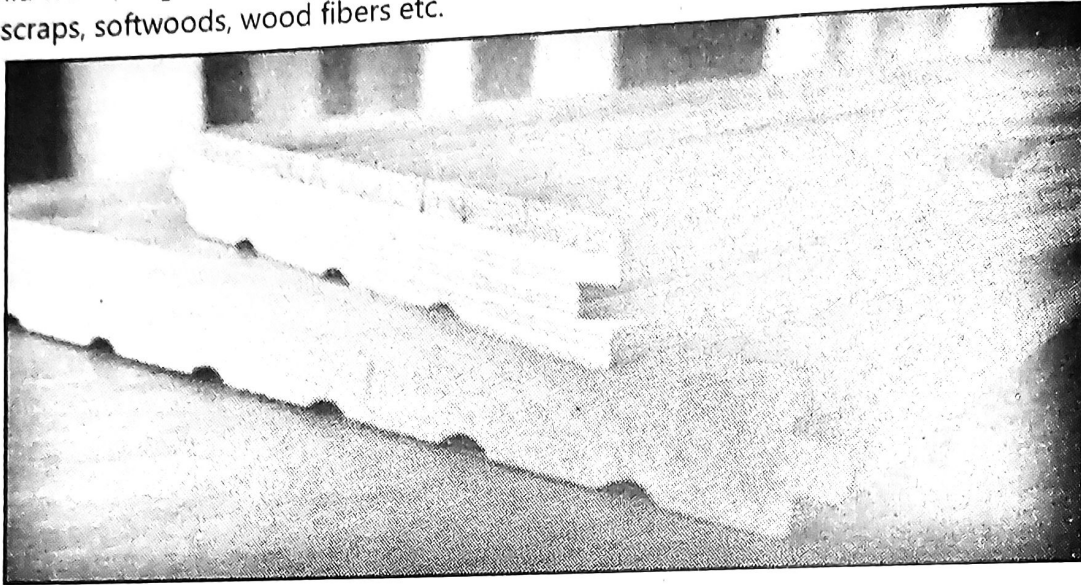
Engineered Wood Board Over Solid Wood Board
